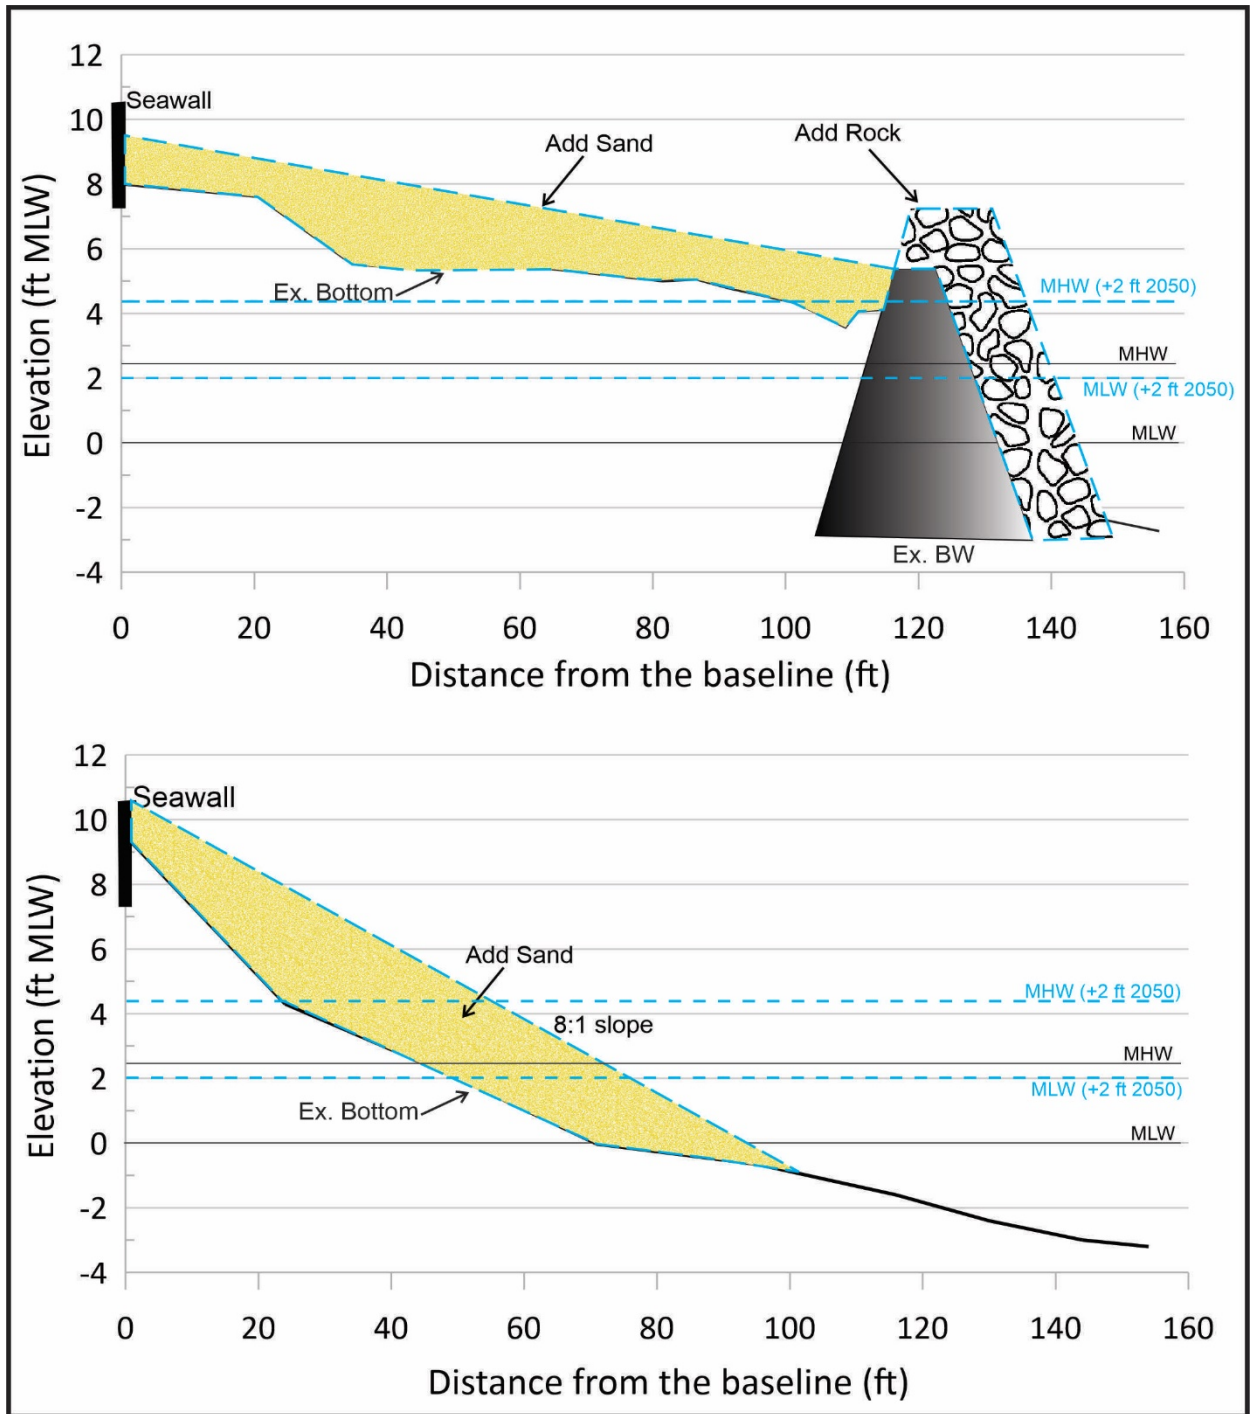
Existing conditions at a high bank breakwater site (VIMS East). The land continues to rise behind the seawall and infrastructure exists so the site could not be graded. To raise the elevation of the system to adjust for the projected 2050 tide level (blue) rock can be added to the structures. In addition, sand can be added behind the structures and in the embayments to enhance adaptability. After Hardaway et al., (2019).
